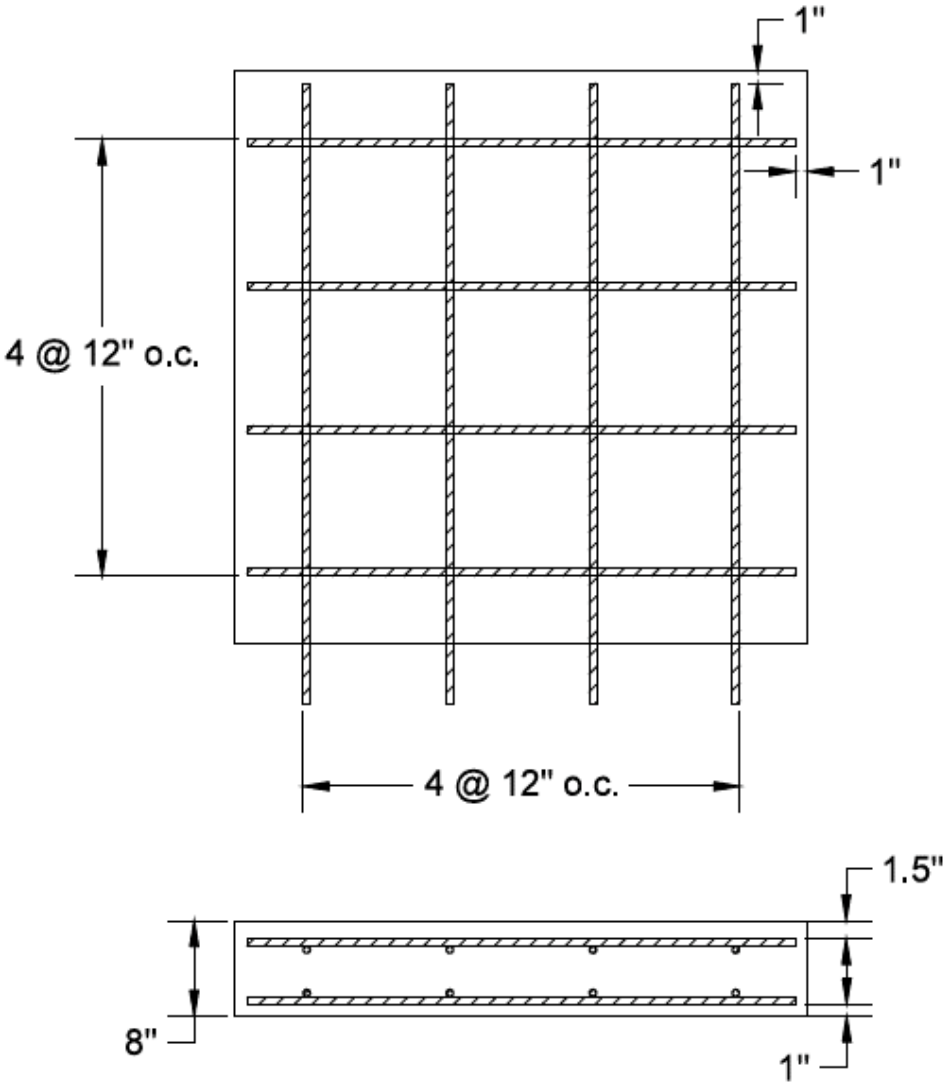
Overhead and cross-sectional view of rebar layout for slab specimens
